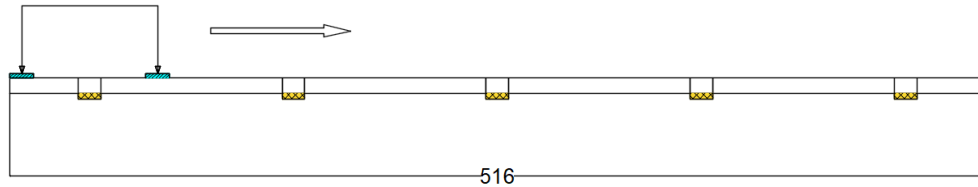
The placement of HL-93 load on the deck slab with 9 ft girder spacing (first combination)
